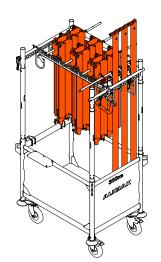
Loading mast sections in the scaffolding assembly and disassembly processes
